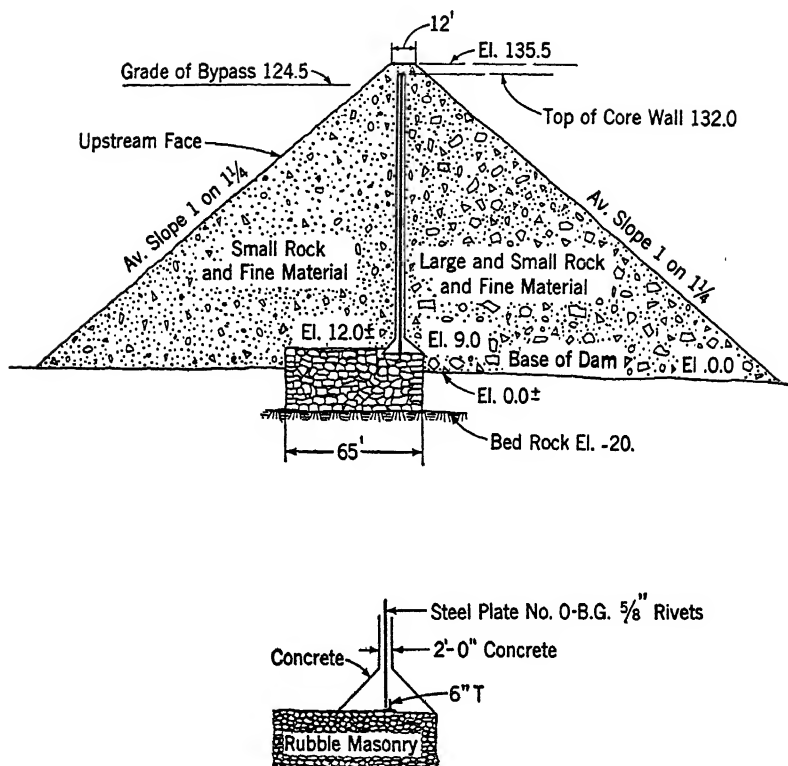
Typical cross-section of Lower Otay Dam. (Courtesy George Cromwell, Chief Engineer, San Diego County Water Co., Los Angeles, Calif.)
